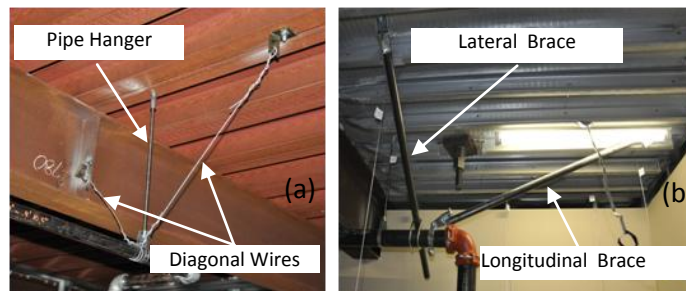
Bracing for piping system: (a) diagonal Splay wires and pipe hanger at the end of each branch line, and (b) lateral and longitudinal brace near riser
